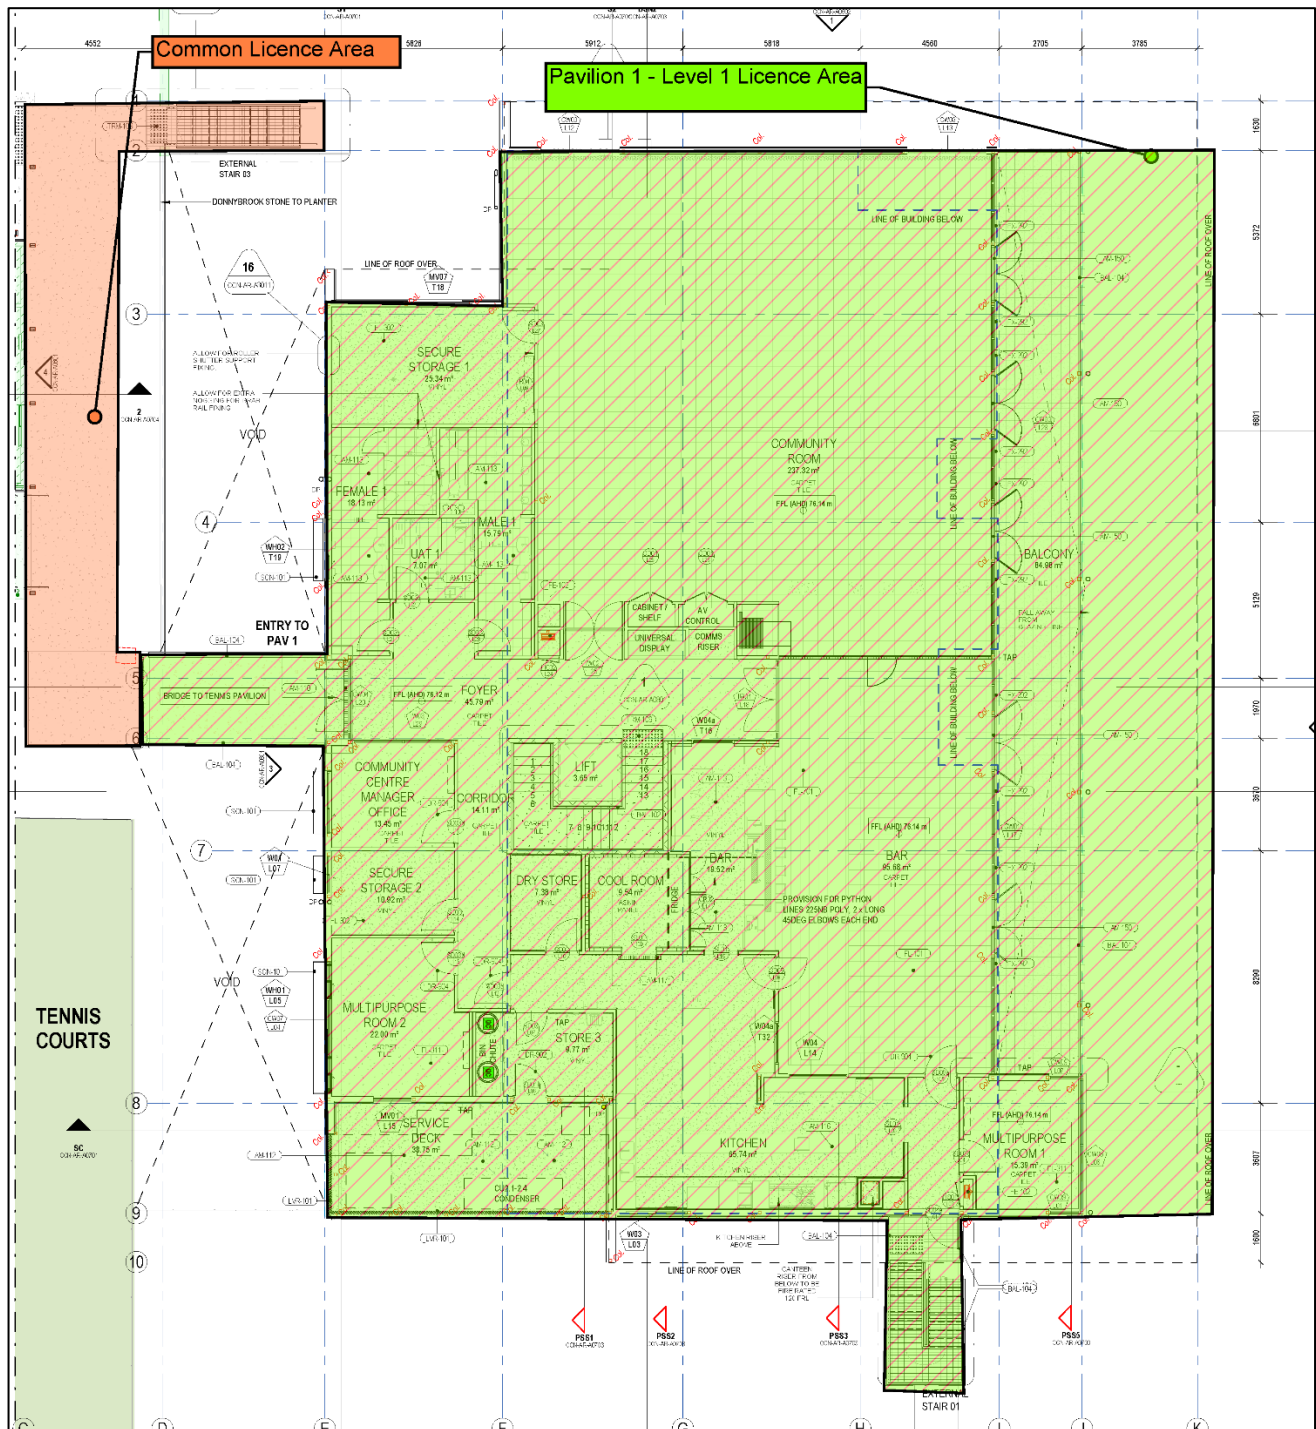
PAVILION 1, LEVEL 1 – PROPOSED LICENCED AREA
